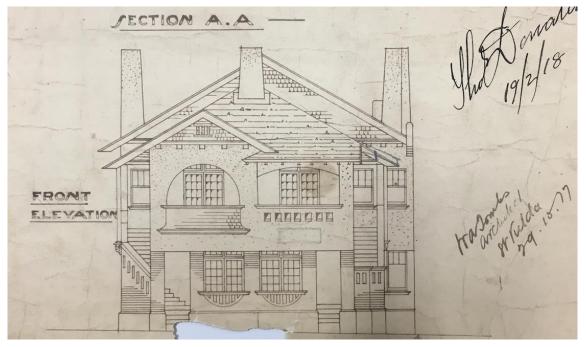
Elevation from the original building plans with architect's signature at right and builder's signature above
